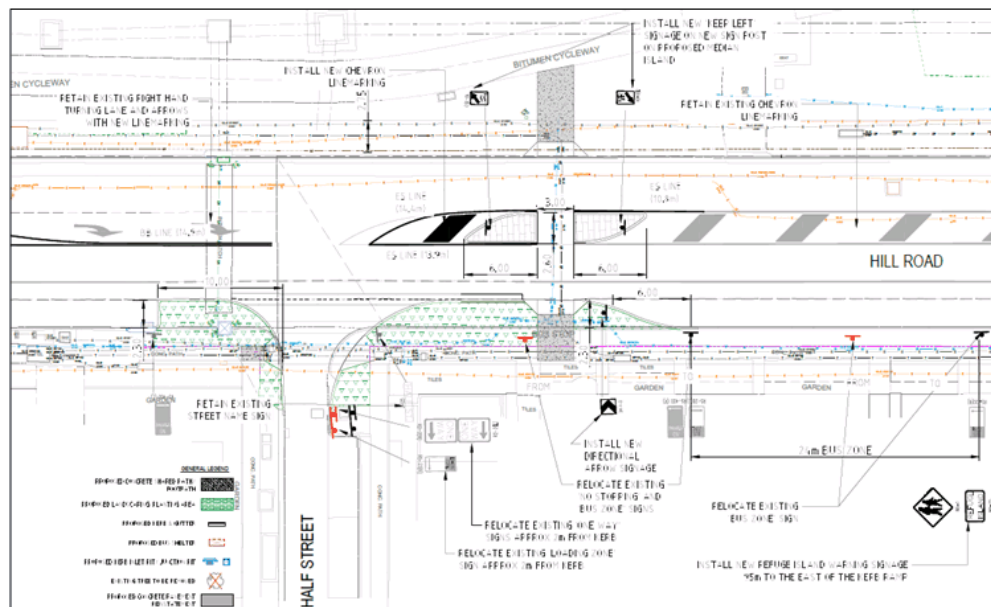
A concept plan of a proposed pedestrian refuge island in Hill Road, Wentworth Point immediately north of Half Street
